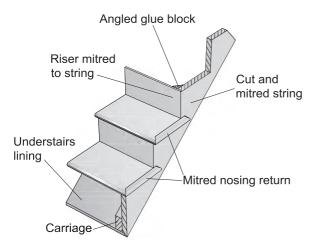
Typical construction of an open staircase with cut and mitred string.
